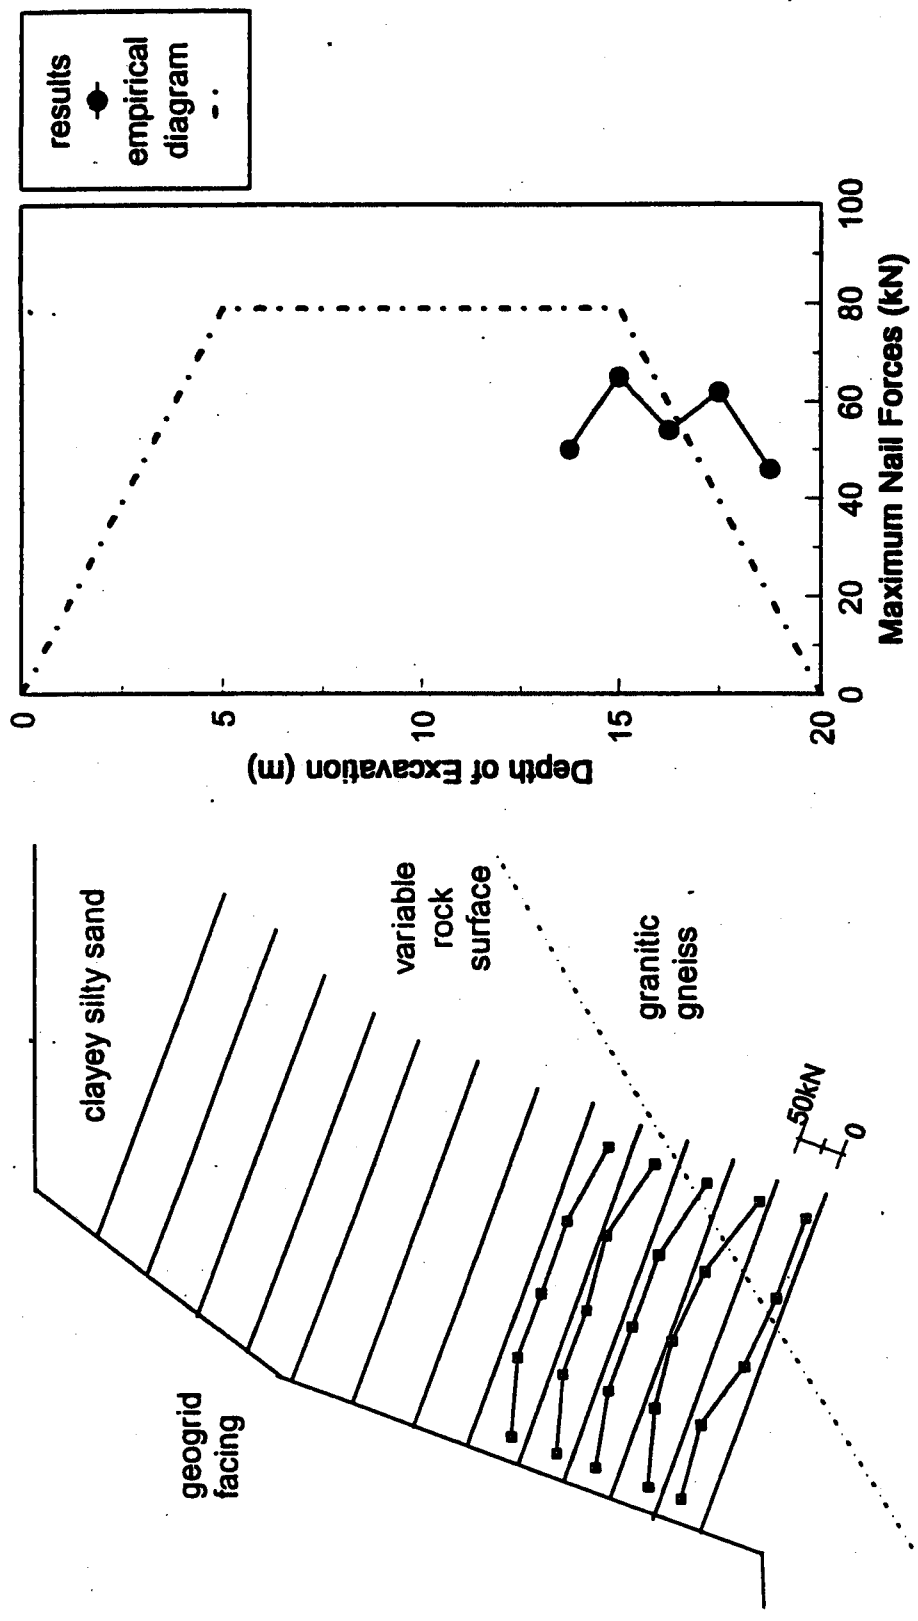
Guernsey Soil Nail Wall axial nail force results.
